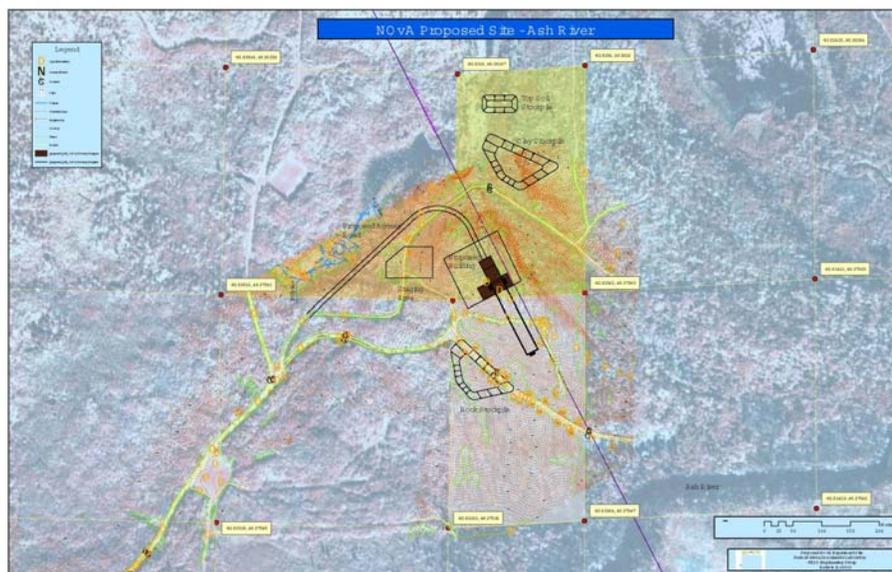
Aerial Photo of the Far Detector Building Site.
